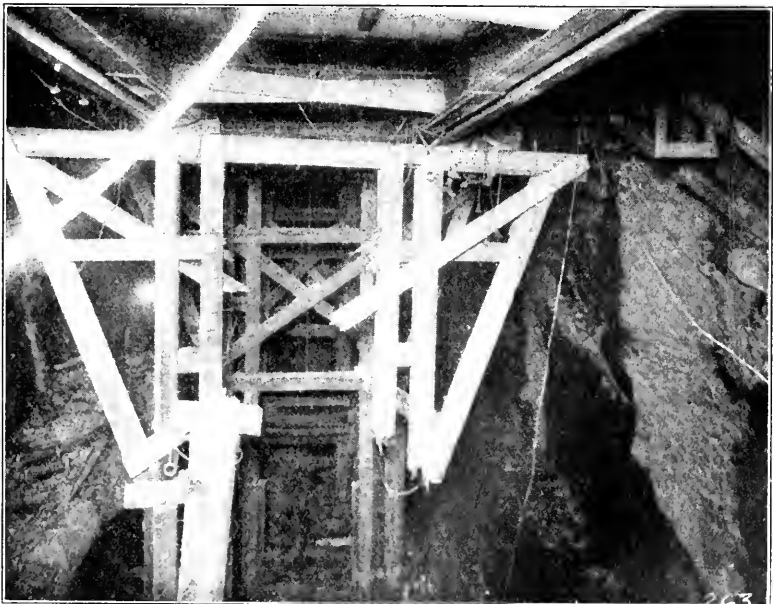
TOWER BENT, BROKEN OFF BY BLAST LASHED TO SUPPORTING BEAMS OVER THE WORKING FACE WHILE BEING REPAIRED.
